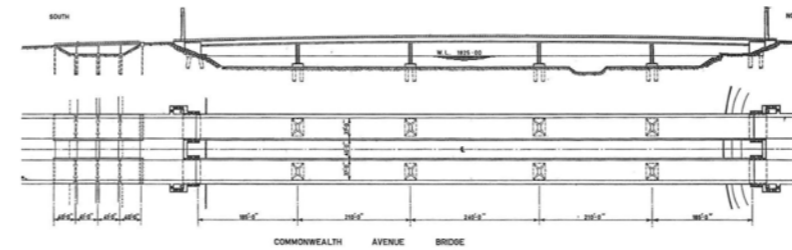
Elevation and plan showing five spans supported by four piers and two abutments, with a shorter beam bridge at the southern end providing an underpass for Flynn Drive. Road access is provided under the main bridge at the northern end.
